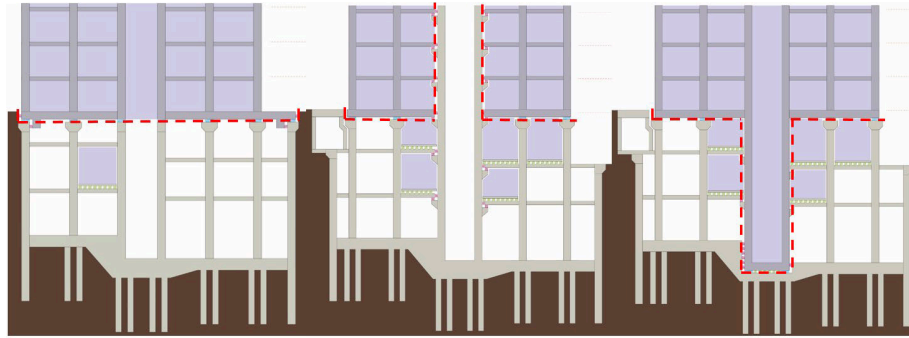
Alternative configurations for building isolation systems incorporated within the building envelope
